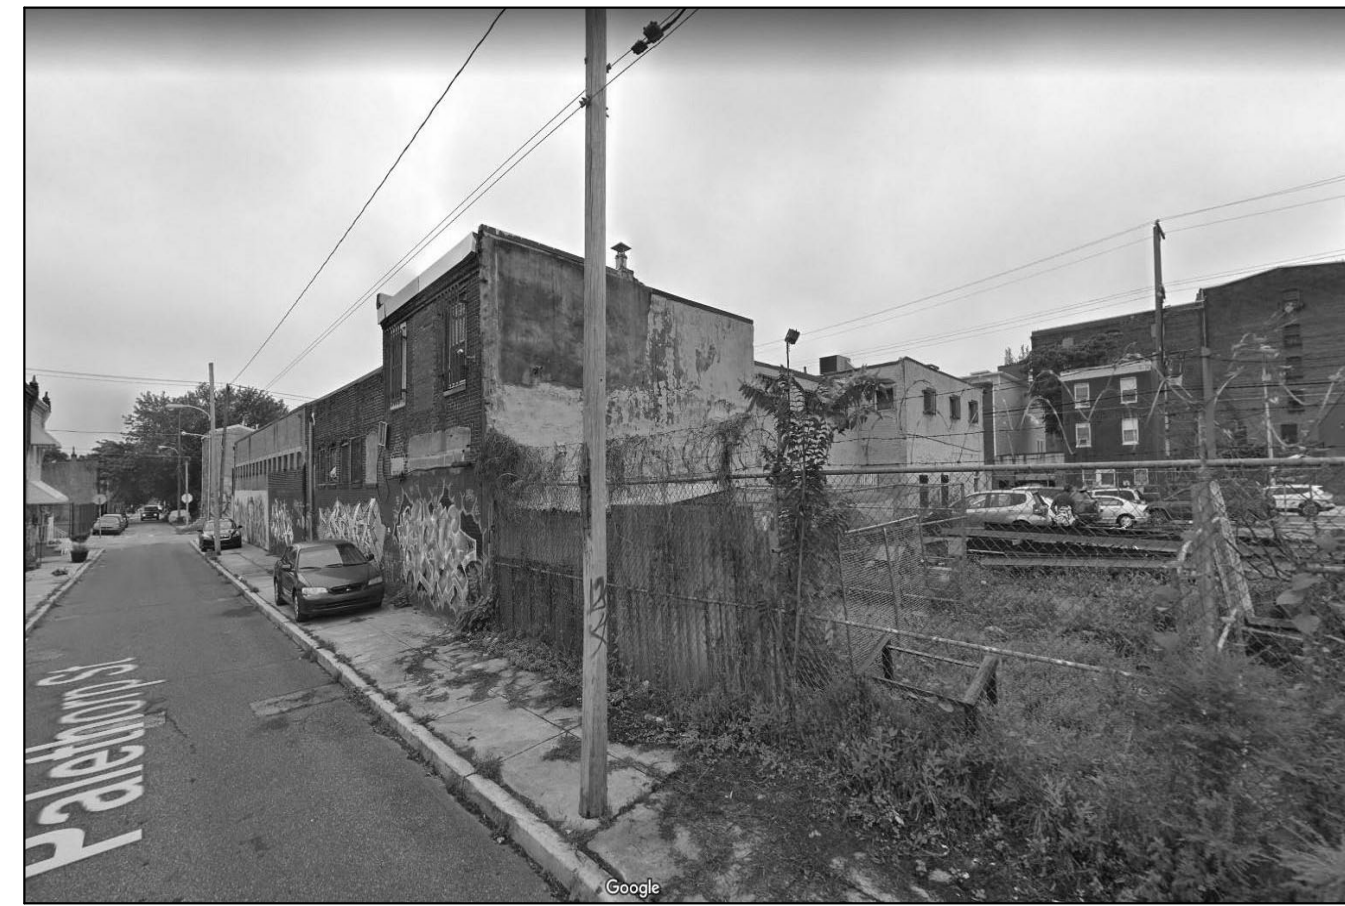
VIEW FROM N. PALETHORP ST LOOKING SOUTHWEST (EXISTING CONDITIONS)
